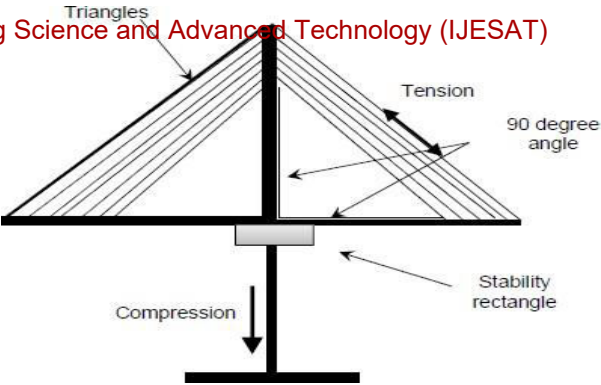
Illustration of Typical Cable Stayed Bridg
